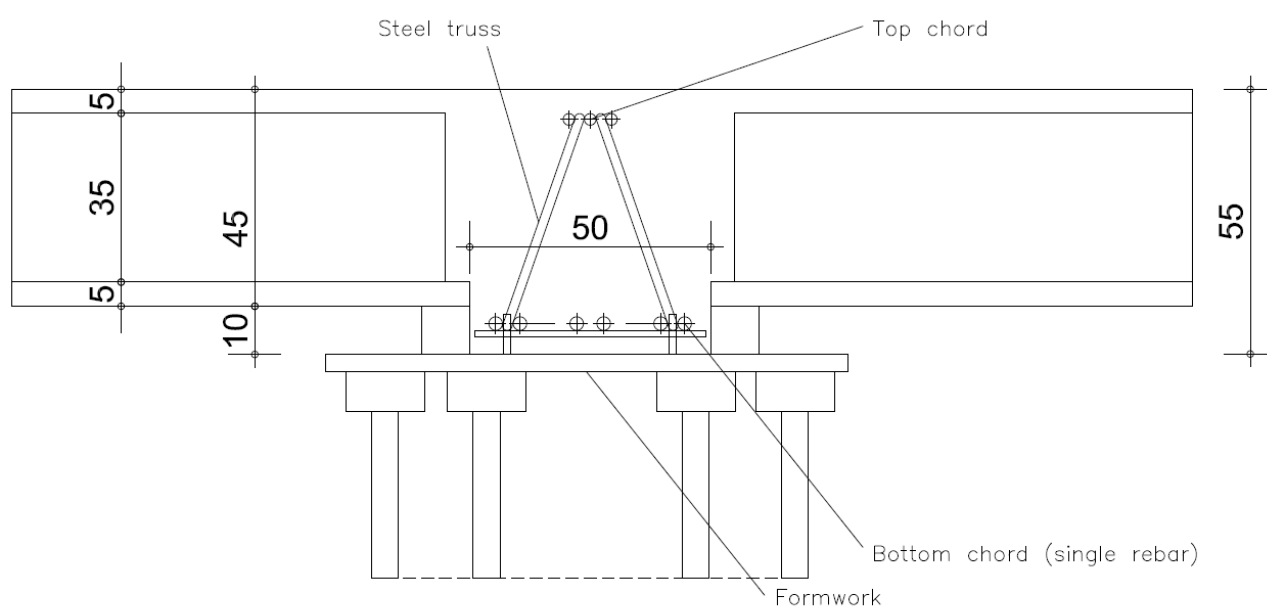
Technical drawing representing the cross section and layout of CSTCBs R103 and R104.
